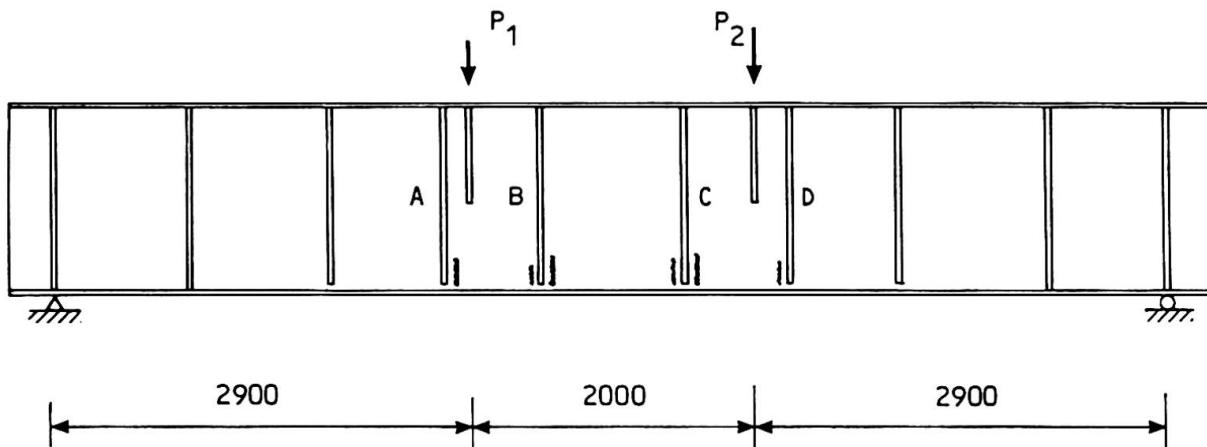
Plate girder; fatigue cracking at lower ends of stiffeners A-D.
